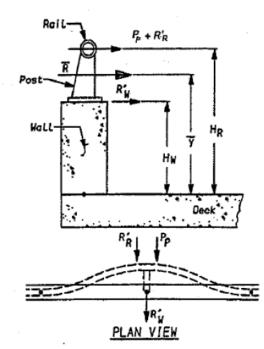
Concrete Wall and Metal Rail Evaluation---Impact at Post.
